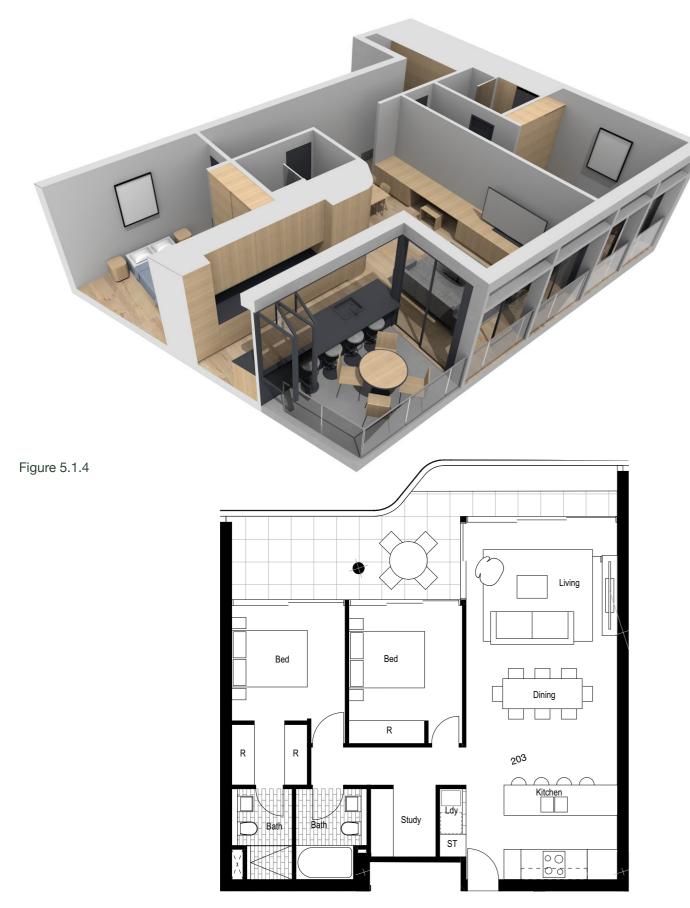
Typical Two Bedroom 1:100 Internal area 80 sqm / Balcony area 20 sqm
